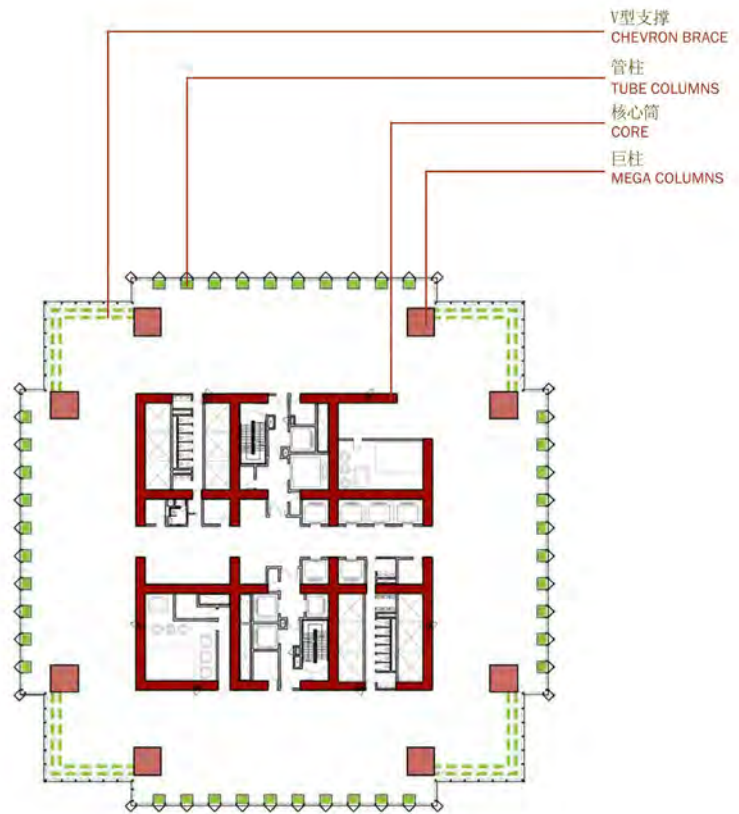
Typical office floor plan showing the location of the mega-columns (Source: Ping An)
